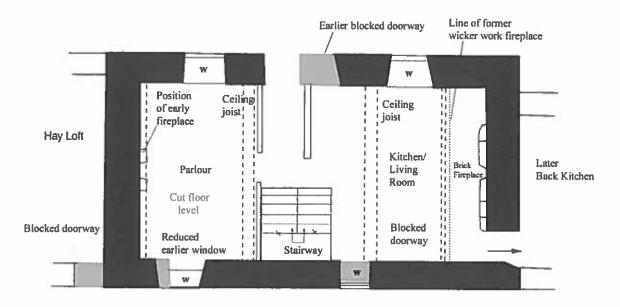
Ground Floor plan at Gelli Gron, Tregaron.
